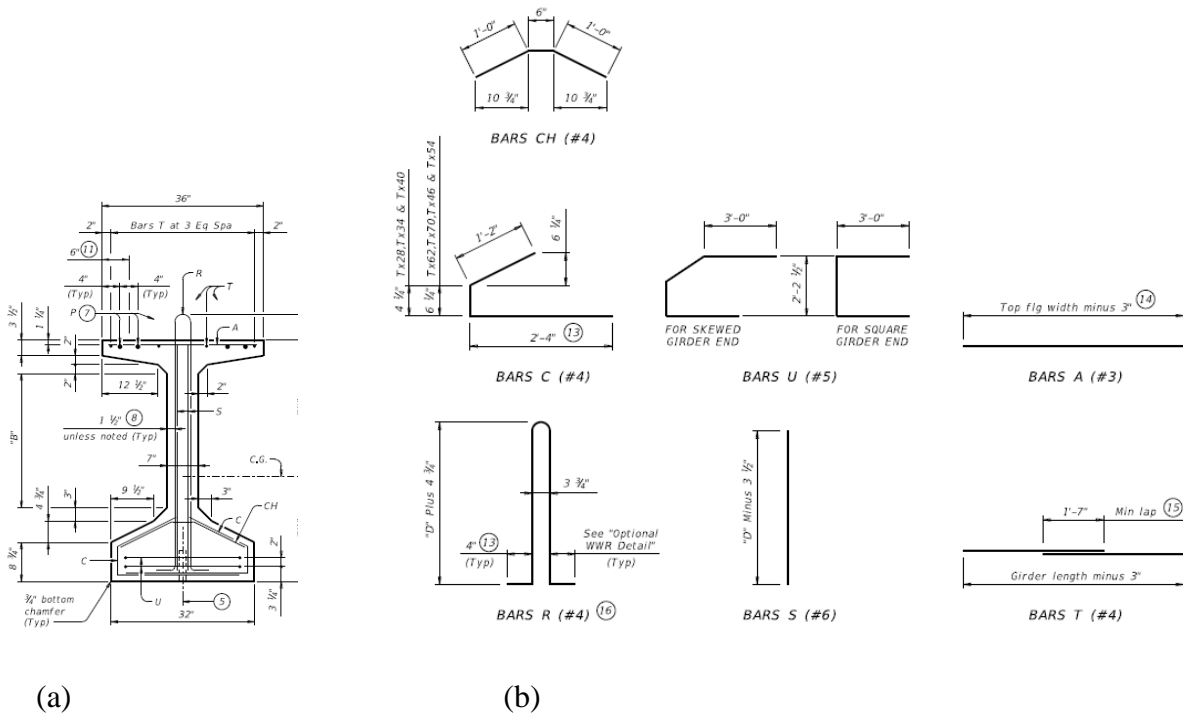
1: Tx54 girder: (a) Mild rebars shown in the girder; and (b) Mild rebars shown separately
